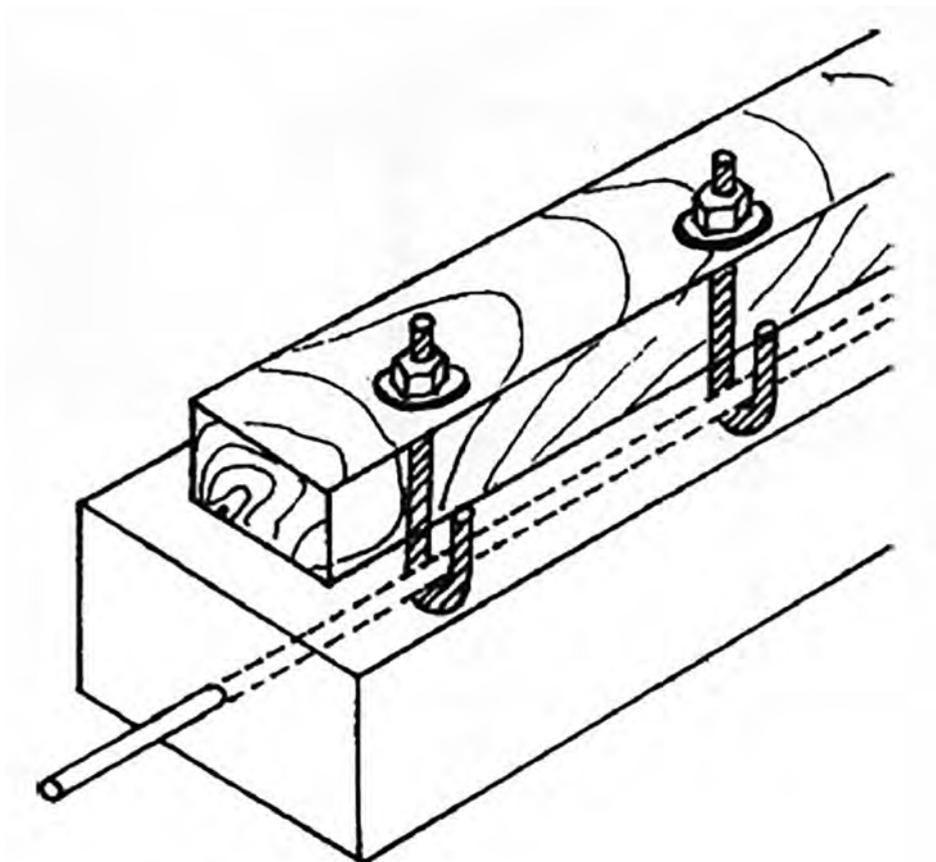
BOTTOM PLATE MUST BE PROPERLY ANCHORED TO THE FOOTING
